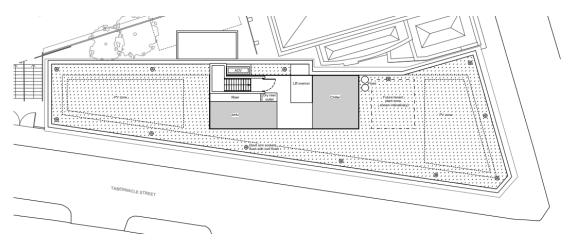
65 Tabernacle Street - Consented roof plan (Ref: P2023/1001/S73)
